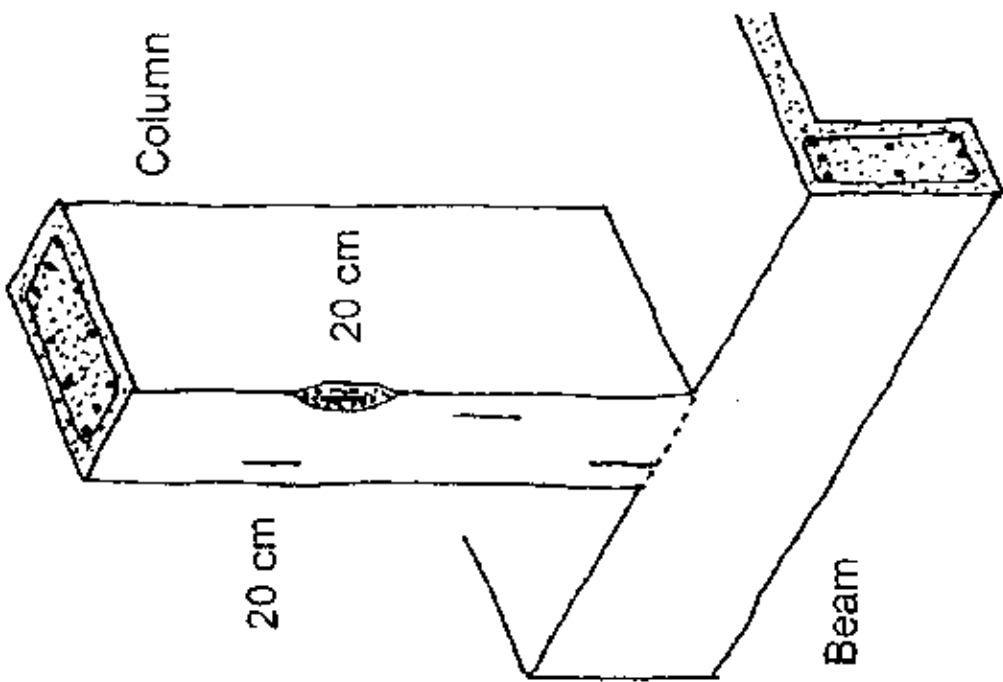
Negligible Cracks and Spalling of Concrete in Damage Rank Evaluation
